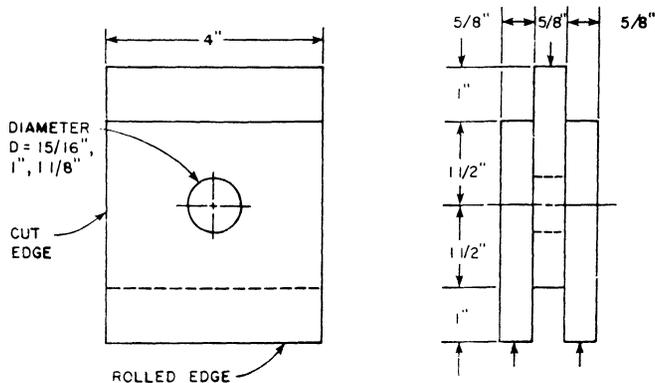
Slip test specimen (1 in. = 25.4 mm)
